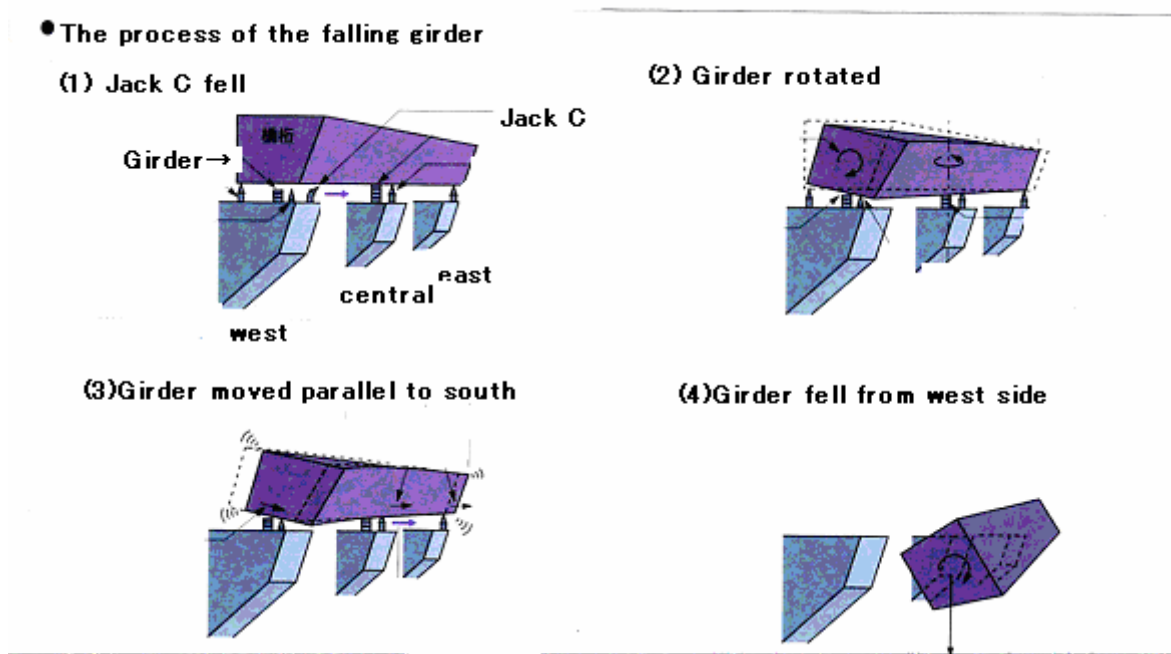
The process of the falling girder (source : "Construction Accident" (Nikkei Construction) p17)
